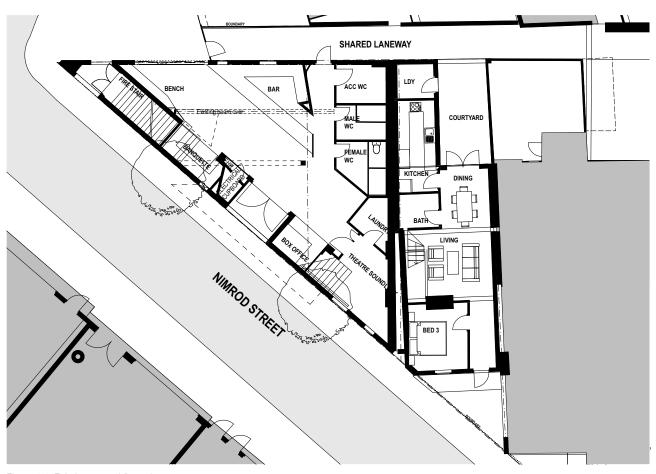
Existing ground floor plan. Source: TZG Architects, 2022.
